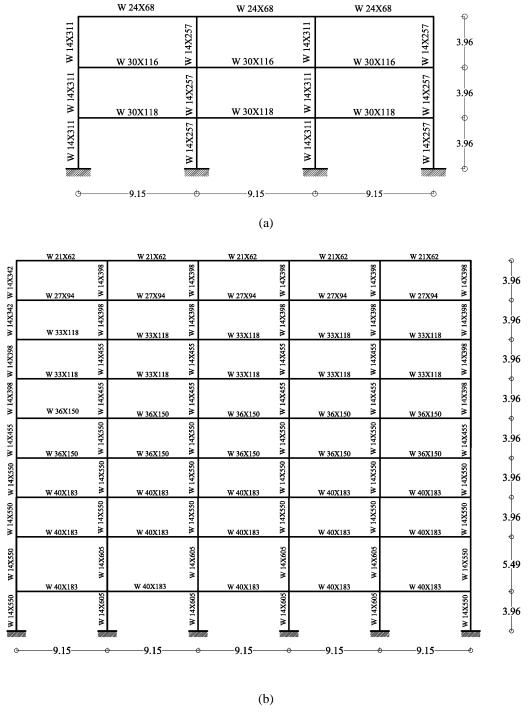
Geometry and cross-sections of steel moment resisting frames: (a) LA3 building, (b) LA9 building.
